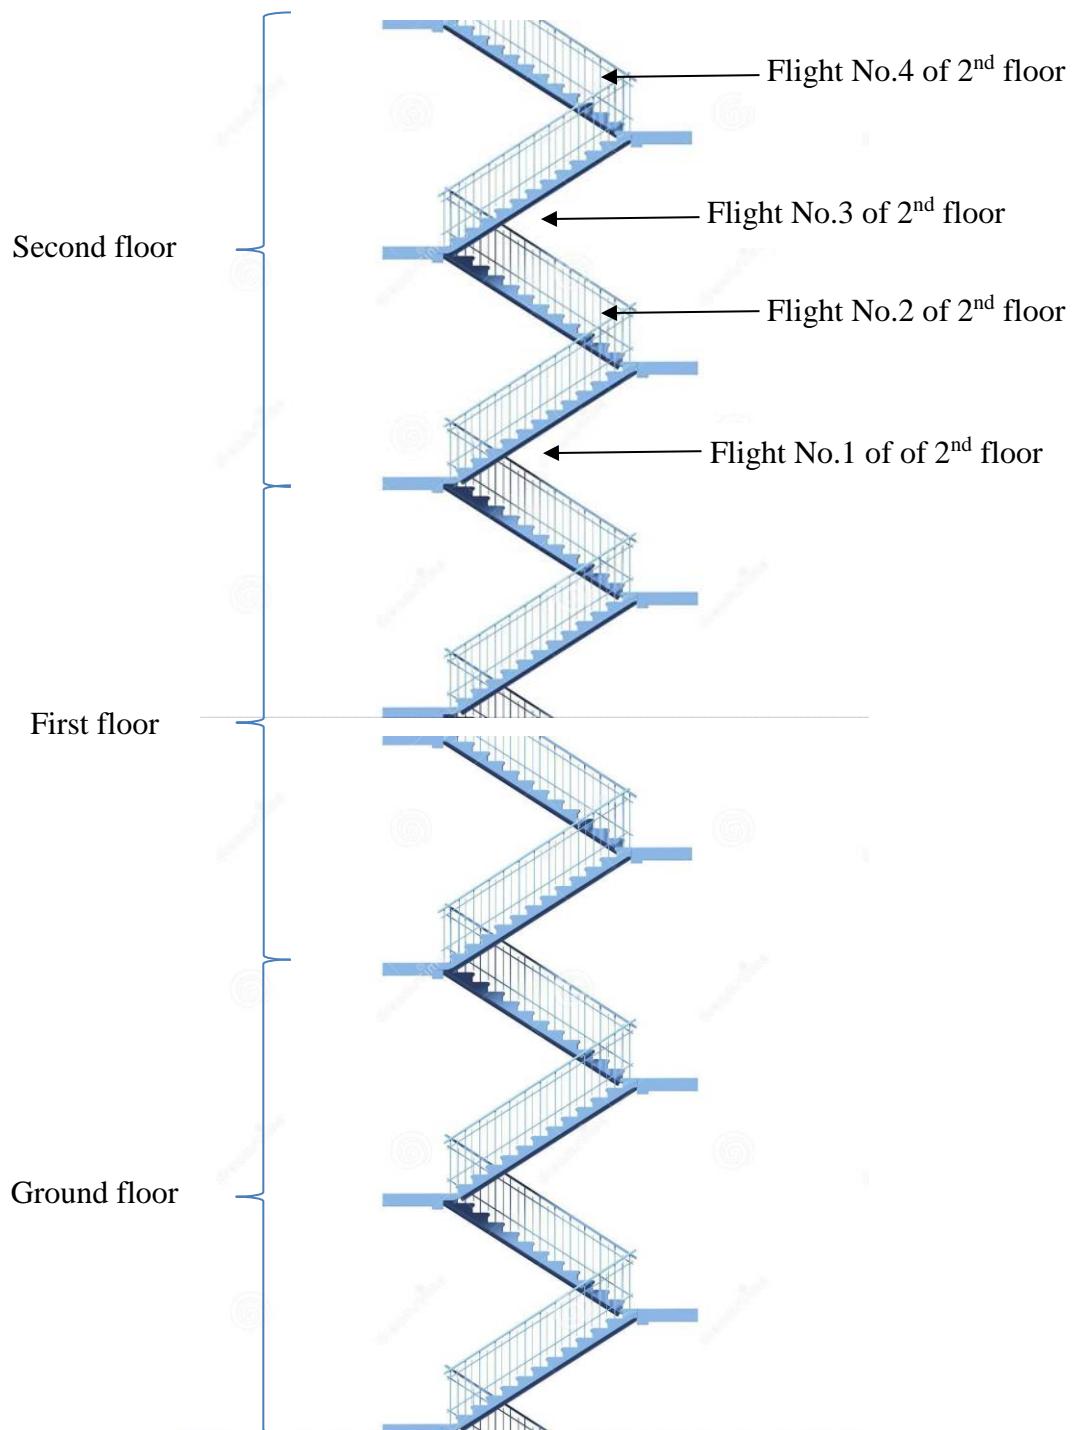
Section View of Staircase from the Ground Floor to the Second Floor.
